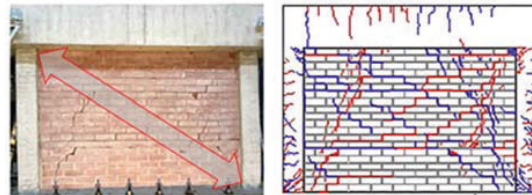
Compression strut failure of RC frame with masonry infill [12]
